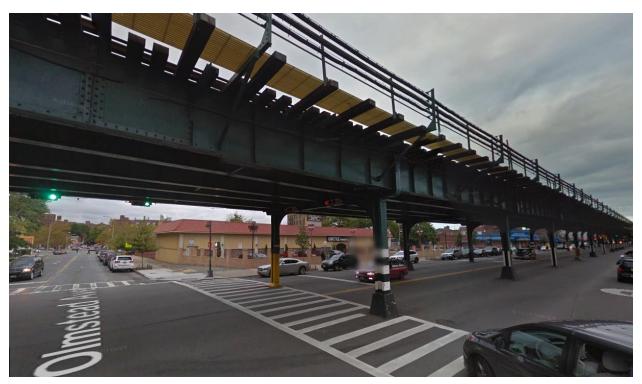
Intersection of Olmstead Avenue and Westchester Avenue, Facing Southwest
